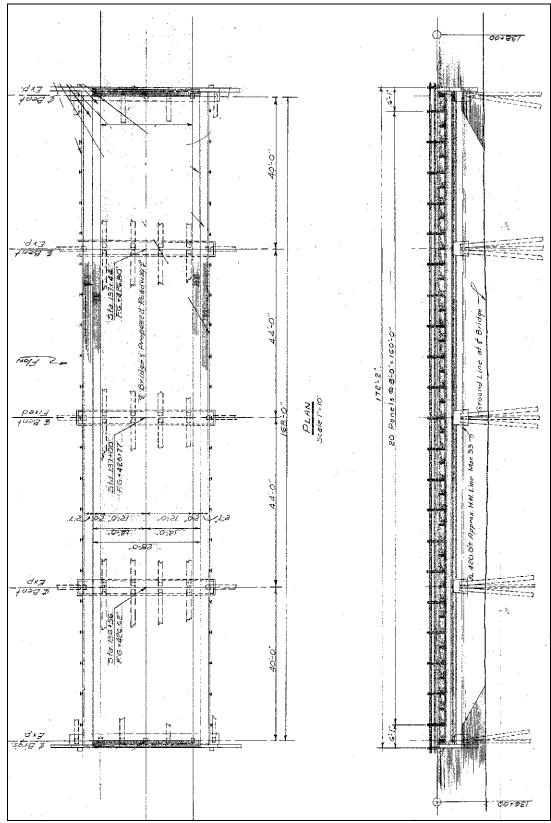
Plan and elevation of bridge from original drawings (NHDOT File No. 3-4-3-5). -
